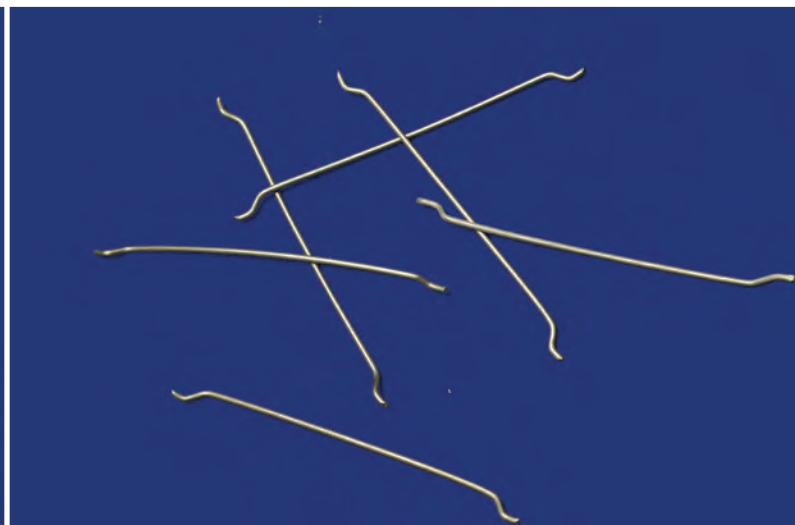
Zenith 60 – provides structural reinforcement to the beam-and-block topping at 10kg/m³.
